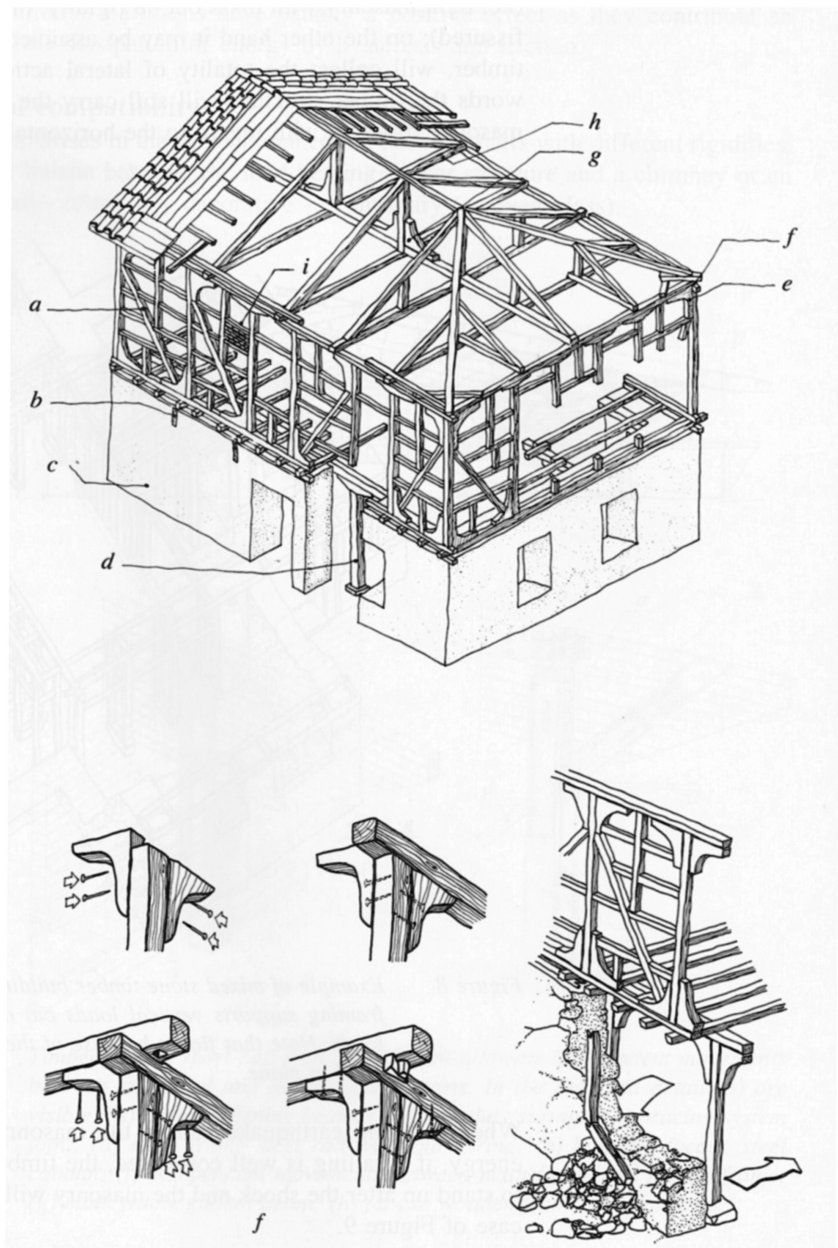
Example of mixed stone-timber building (Greek Islands, 1500 B.C.). Timber framing supports vertical loads but only heavy masonry can resist lateral loads. Note that floors because of their workmanship cannot be considered rigid in plane.
